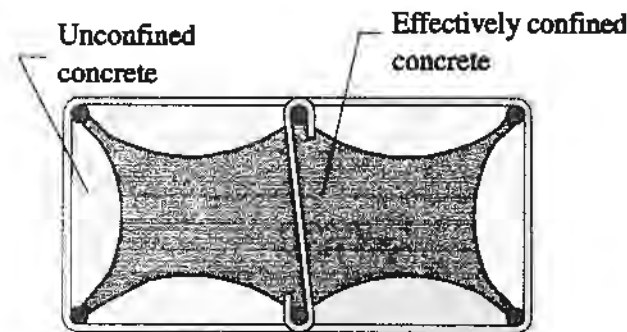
The concrete section divided into unconfined concrete and effectively confined concrete. Compressive arches between the longitudinal bars are shown.
